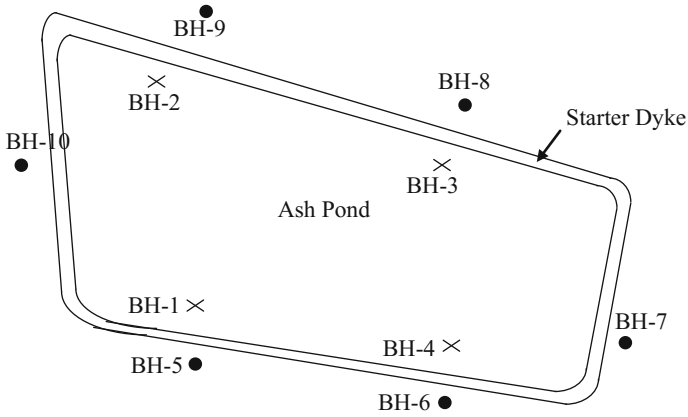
Plan of the ash pond and location of the boreholes drilled
